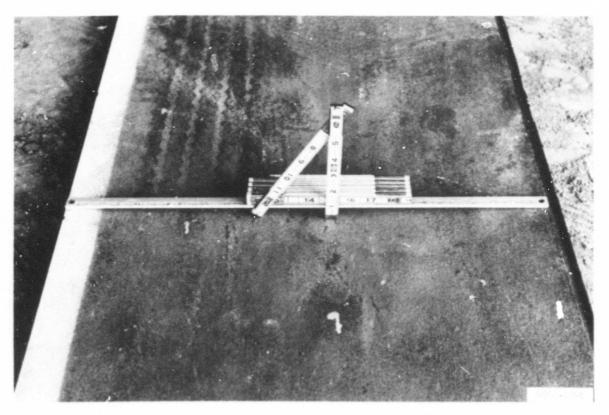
Test section 1, lane 1, after 298 coverages (failure)
